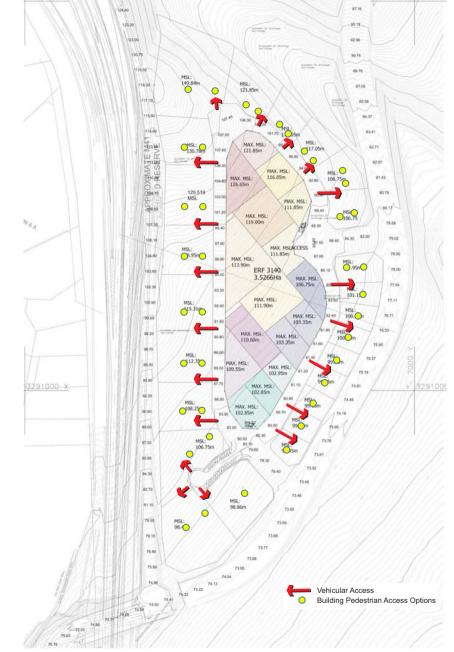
5 Site Access and Pedestrian Access Layout Plan
